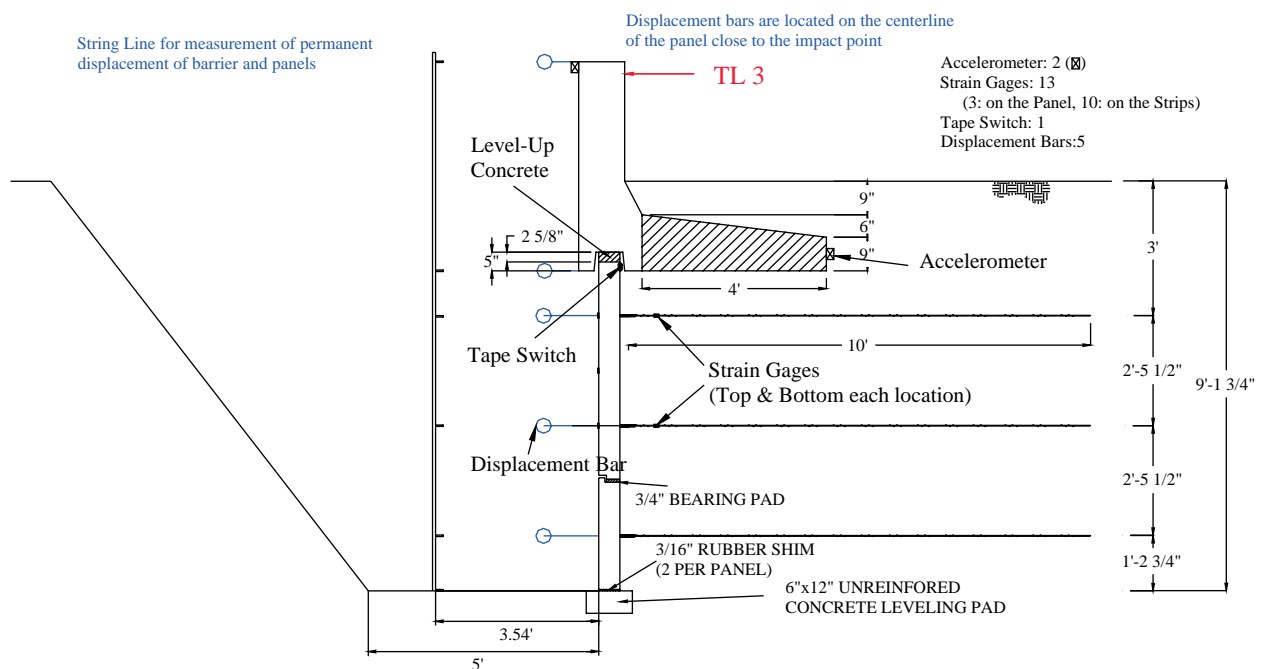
Side view of TL-3 crash test with 32 in. tall vertical wall barrier.
